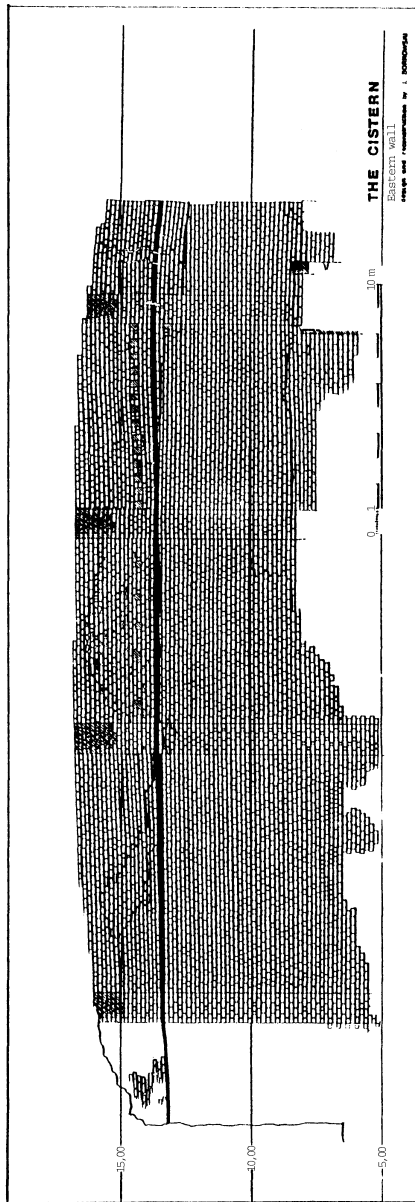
Cistern, east wall. Design and reconstruction J. Borkowski.
